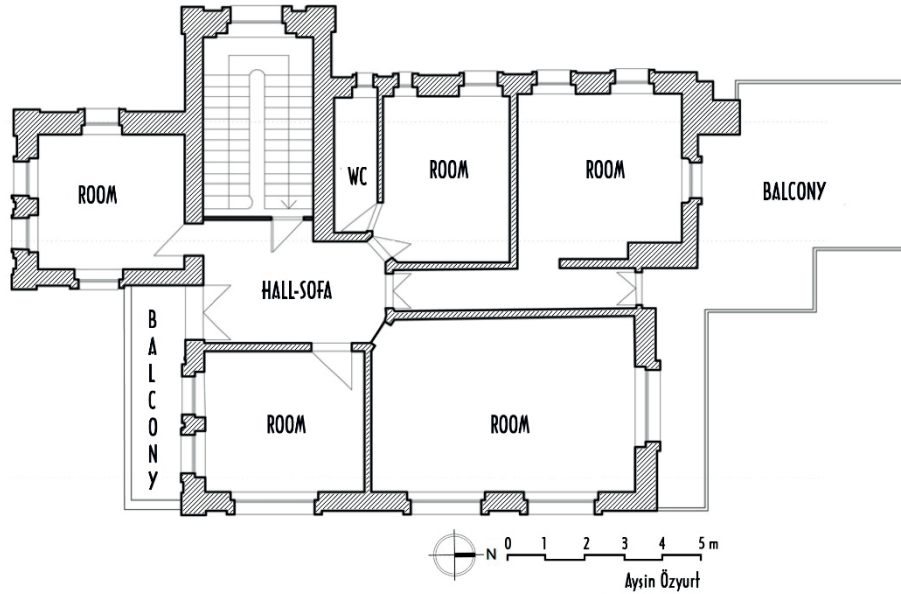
First Floor Plan of Atatürk House (Ayşin Özyurt Archive)
